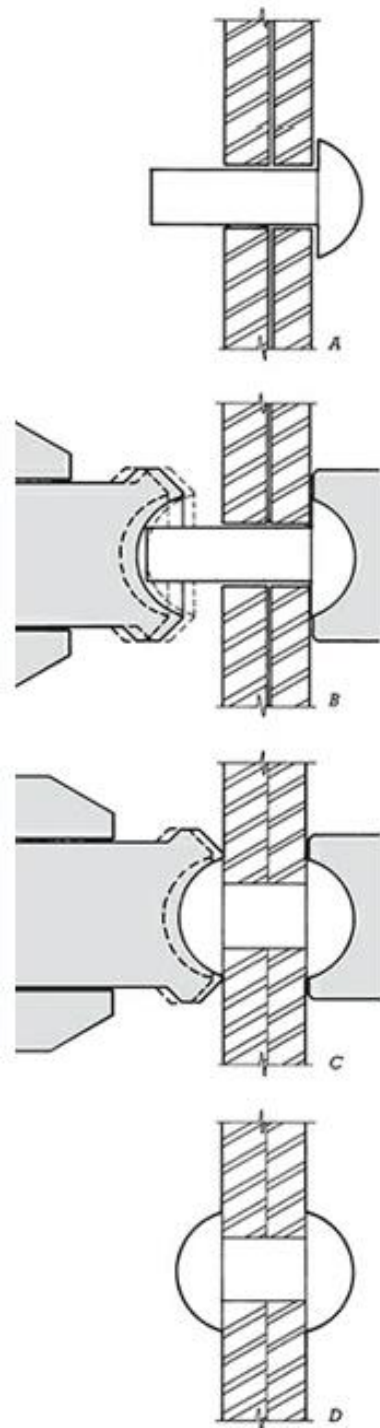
How riveted connections are made. (A) A hot steel rivet is inserted through holes in the two members to be joined. (B, C) Its head is placed in the cup-shaped depression of a heavy, hand-held hammer. A pneumatic hammer drives a rivet set repeatedly against the body of the rivet to form the second head. (D) The rivet shrinks as it cools, drawing the members tightly together.
